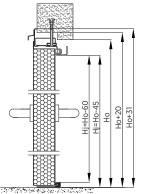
Installation of a double-leaf door to a masonry wall – corner frame with a thermal break – vertical cross-section
